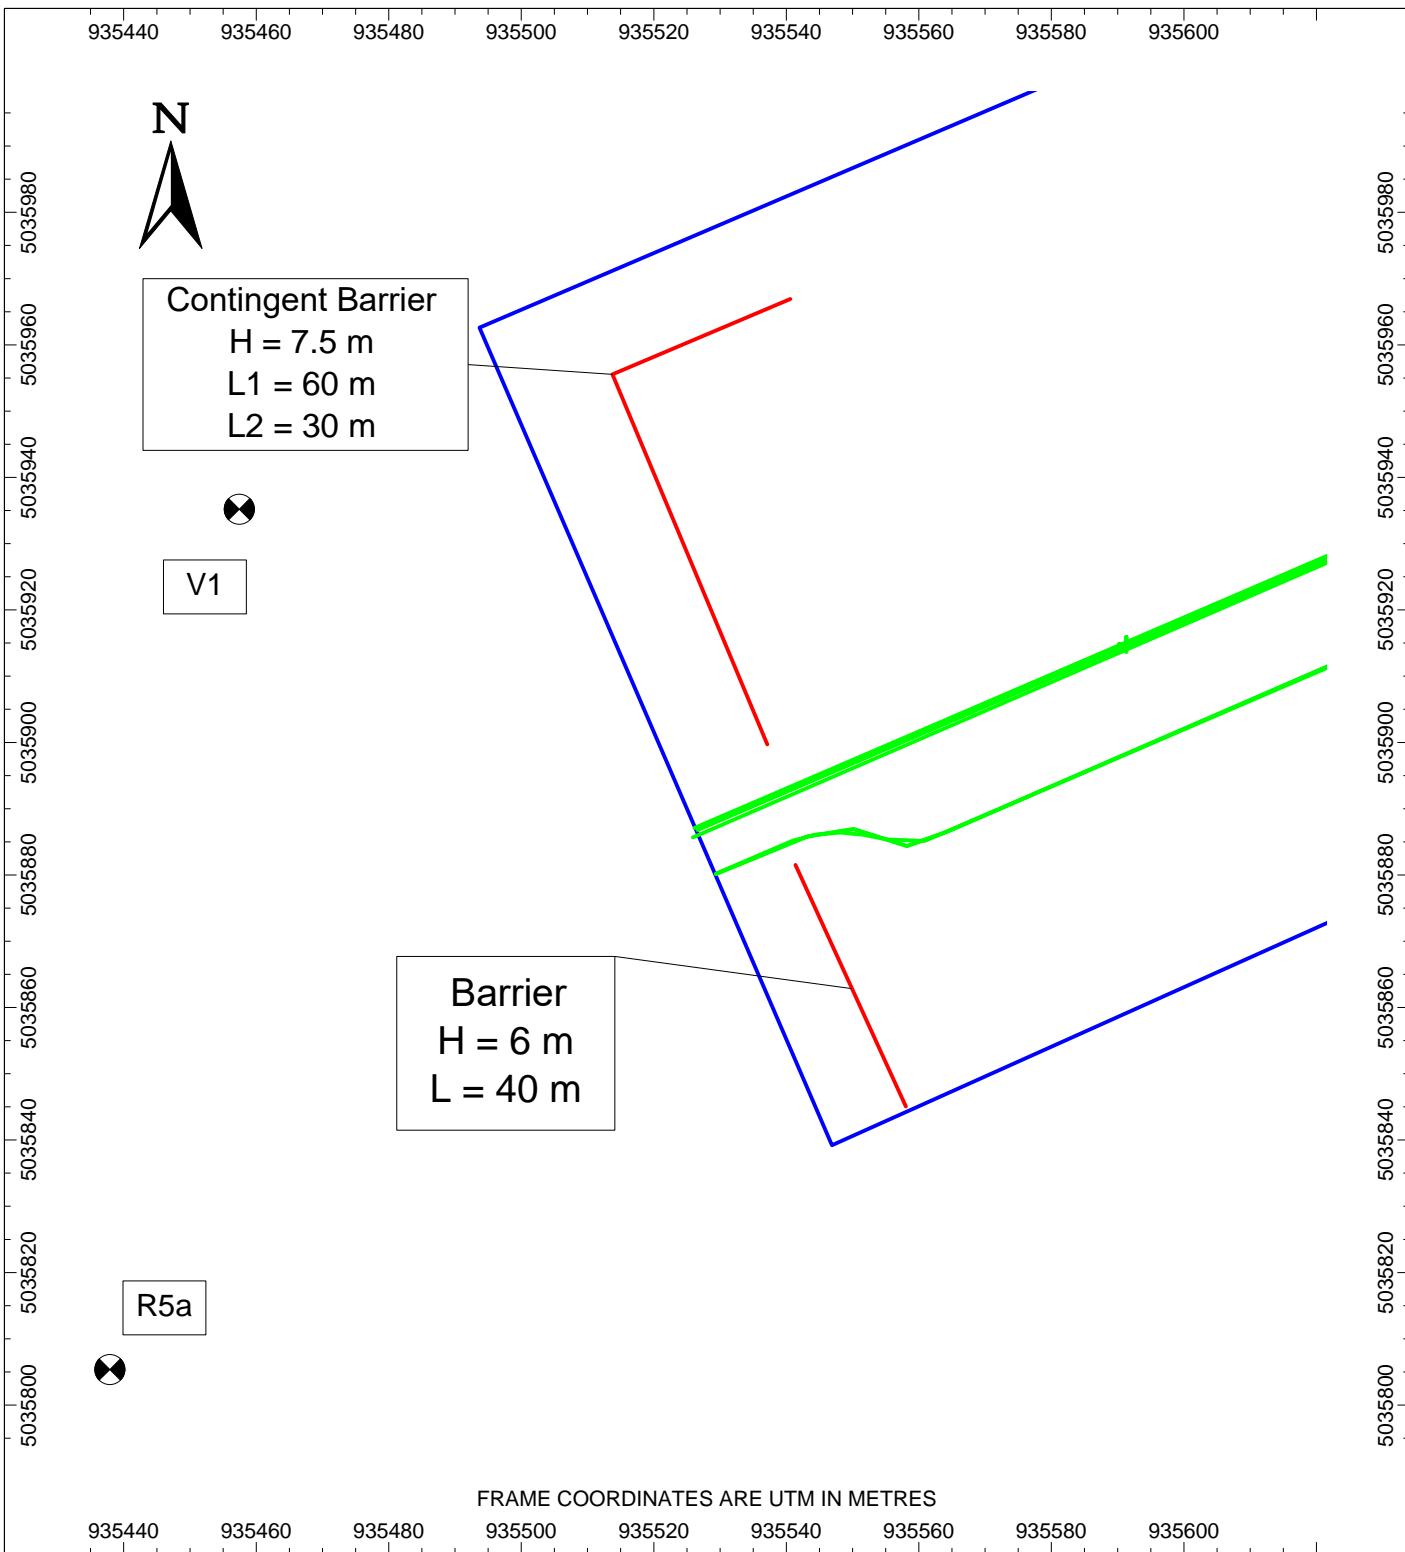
D-Squared Site Plan Showing Locations of Proposed Perimeter Barriers
